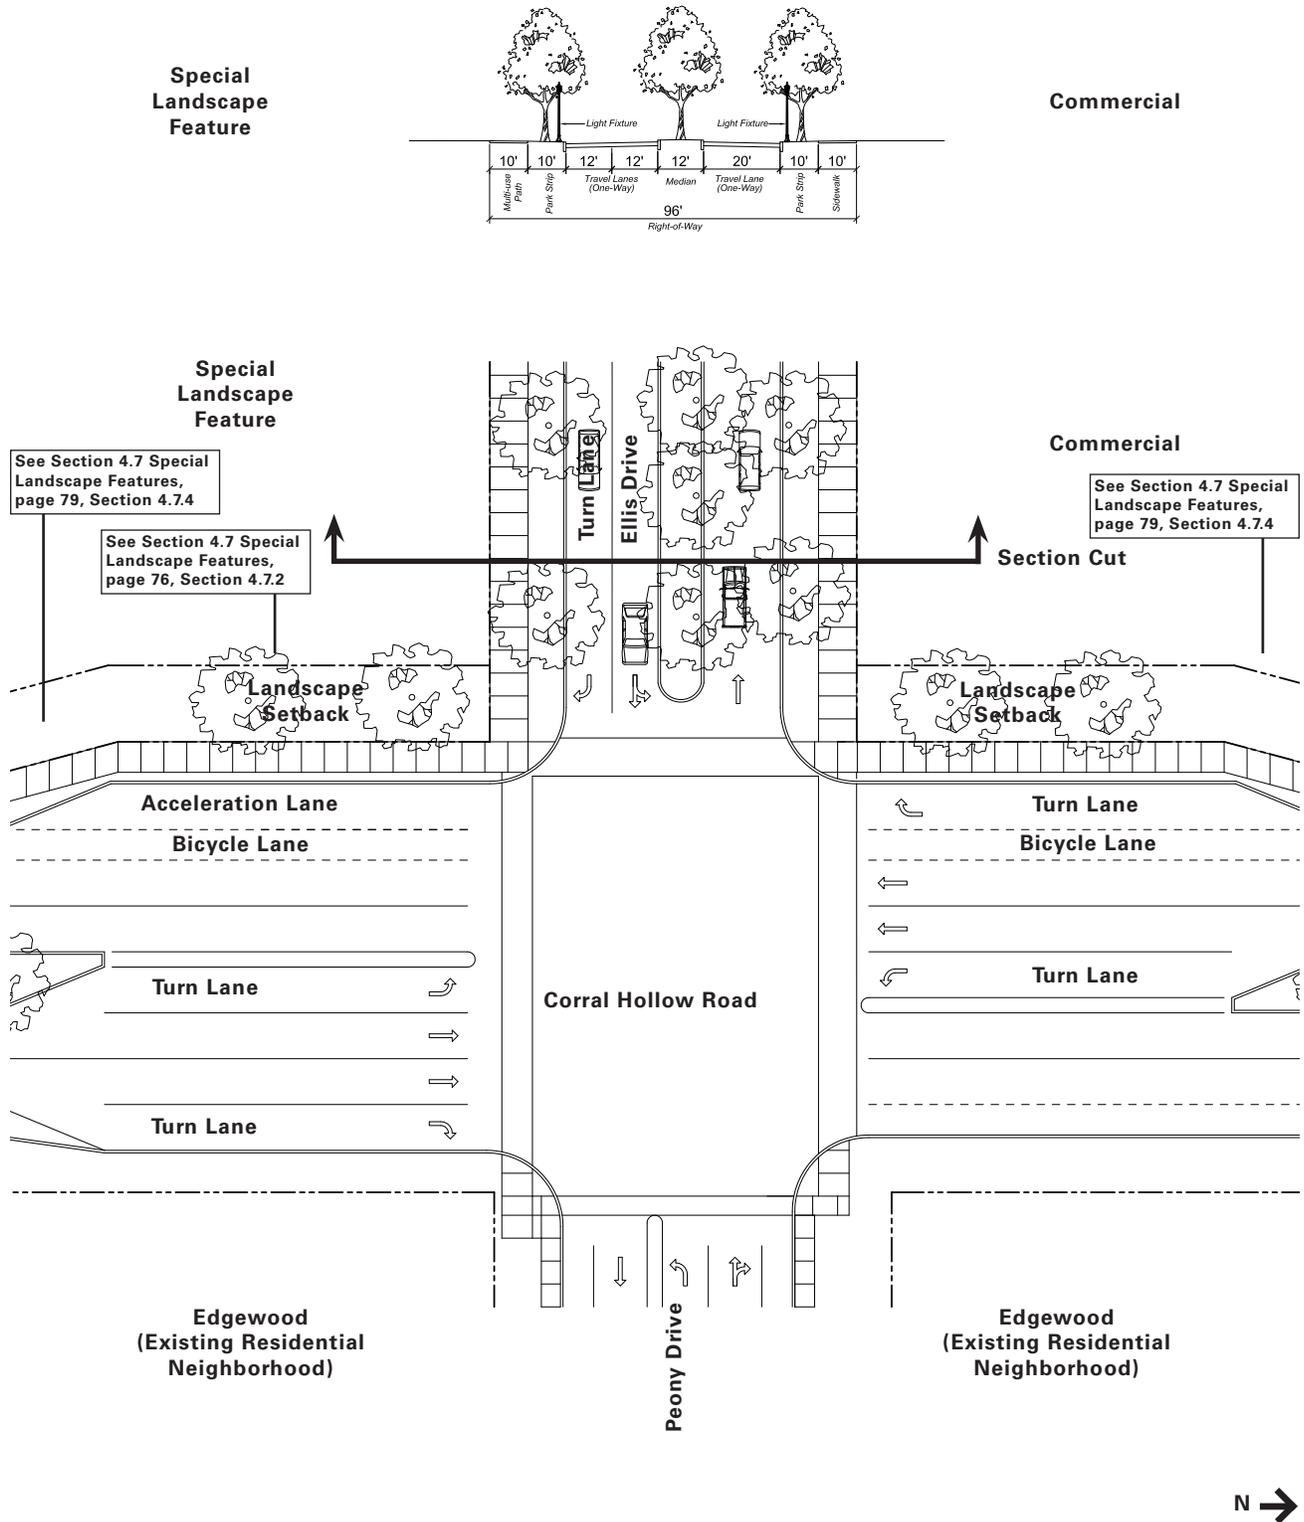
Proposed Section and Plan: Entry Street C (Ellis Drive)
